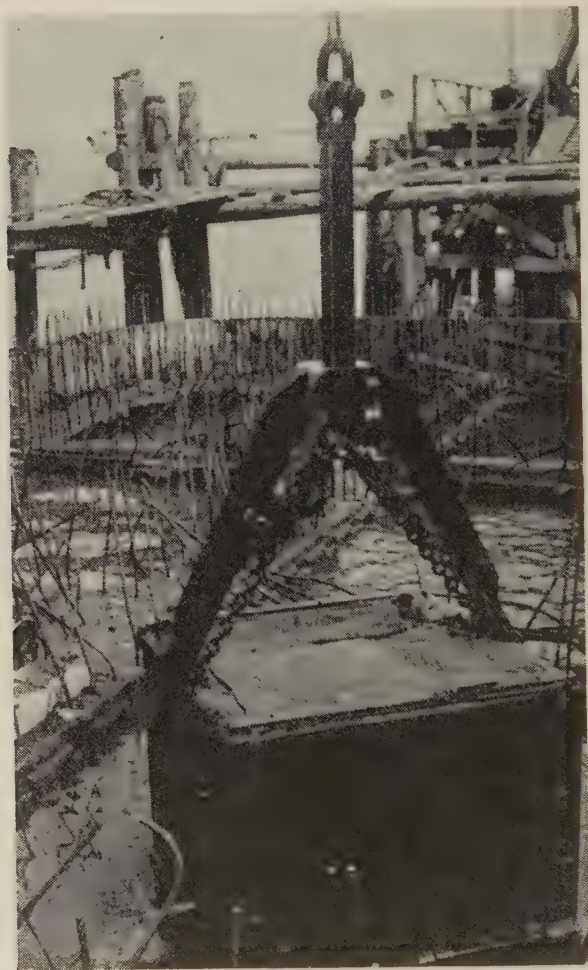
BUCKET OF CONCRETE, WITH A CANVAS COVER, FOR PLACING UNDER WATER
